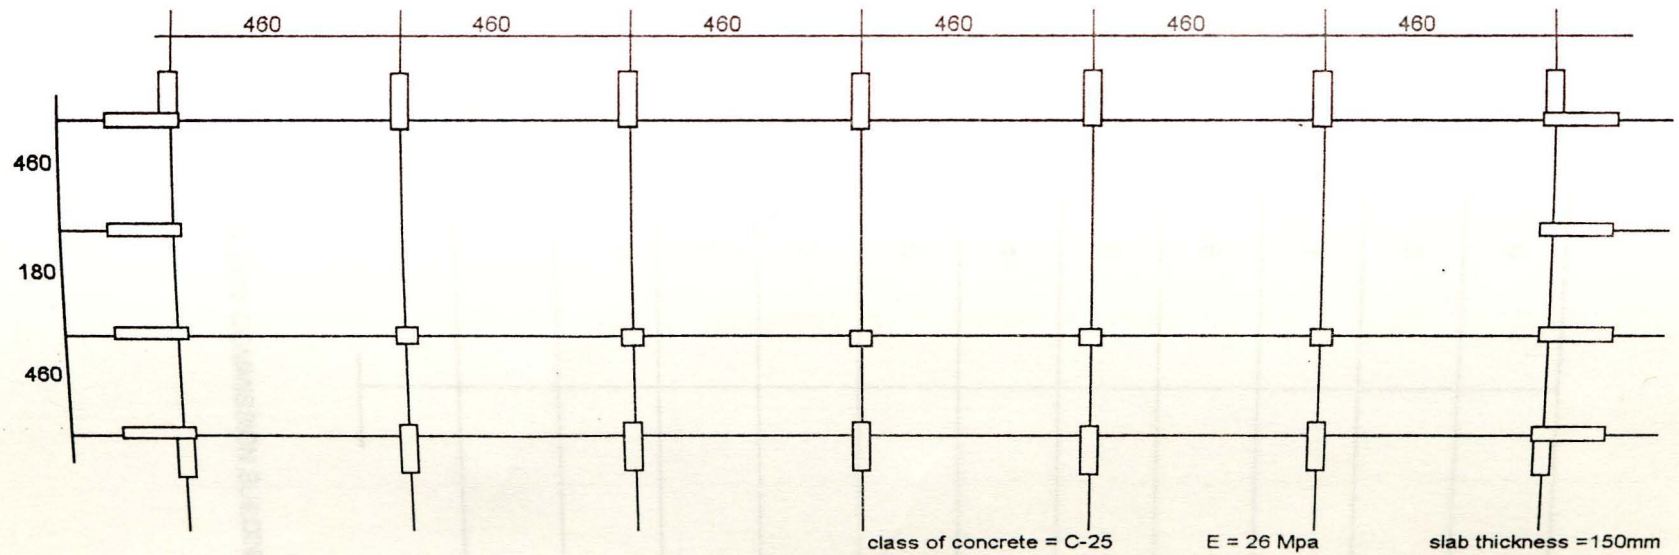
SCIENCE & TECHNOLOGY COMMISSION BUILDING FLOOR PLAN.
